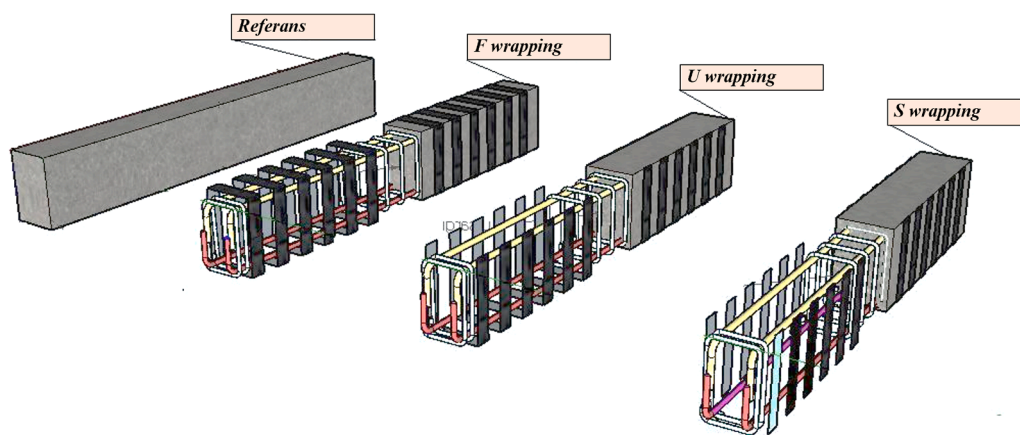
Details of CFRP strengthening applied to the experimental beams.
